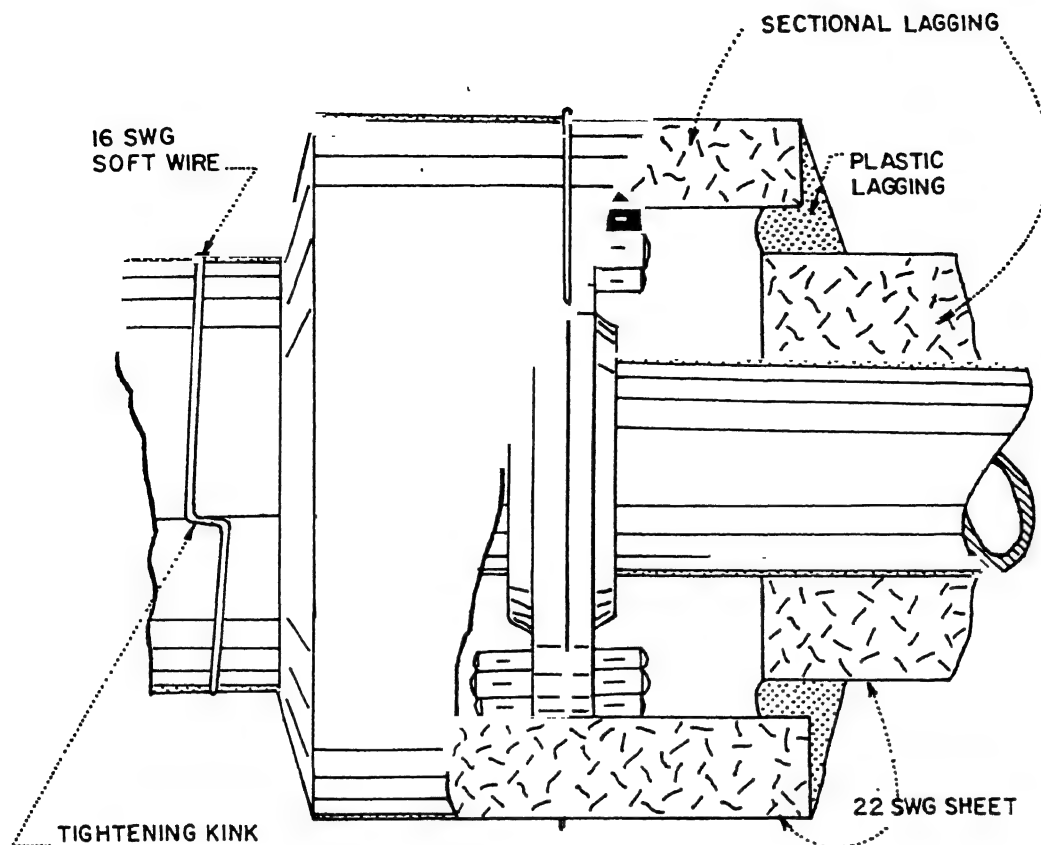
Sectional moulded lagging on pipe flange protected by sheet steel
